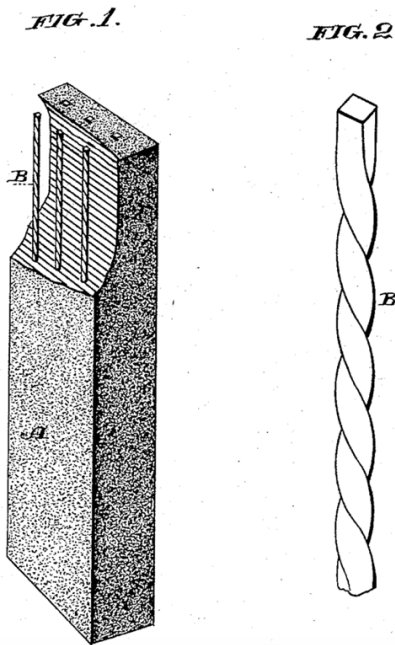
Ransome, Ernest. Building Construction. US Patent 305,226, filed May 1, 1884, and issued September 9, 1884.
